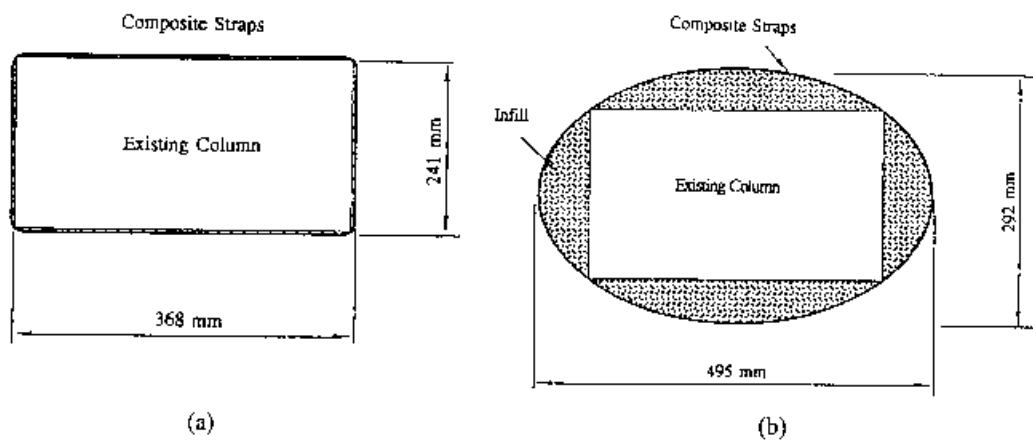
Retrofit with (a) Rectangular and (b) Oval-Shaped composite straps.
